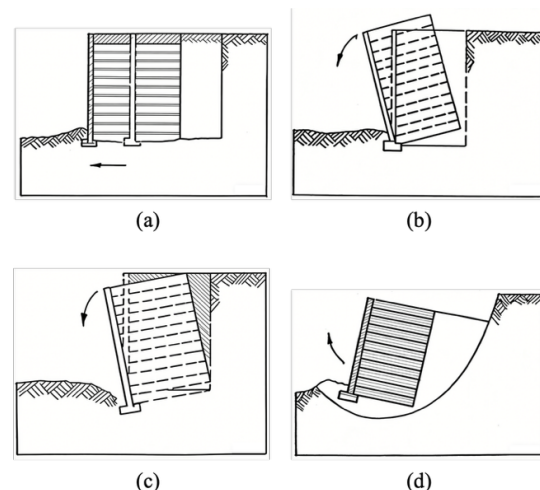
Typical external failure mechanisms for GRS-RW: (a) sliding; (b) overturning; (c) bearing capacity failure; (d) deep-seated instability [10]
